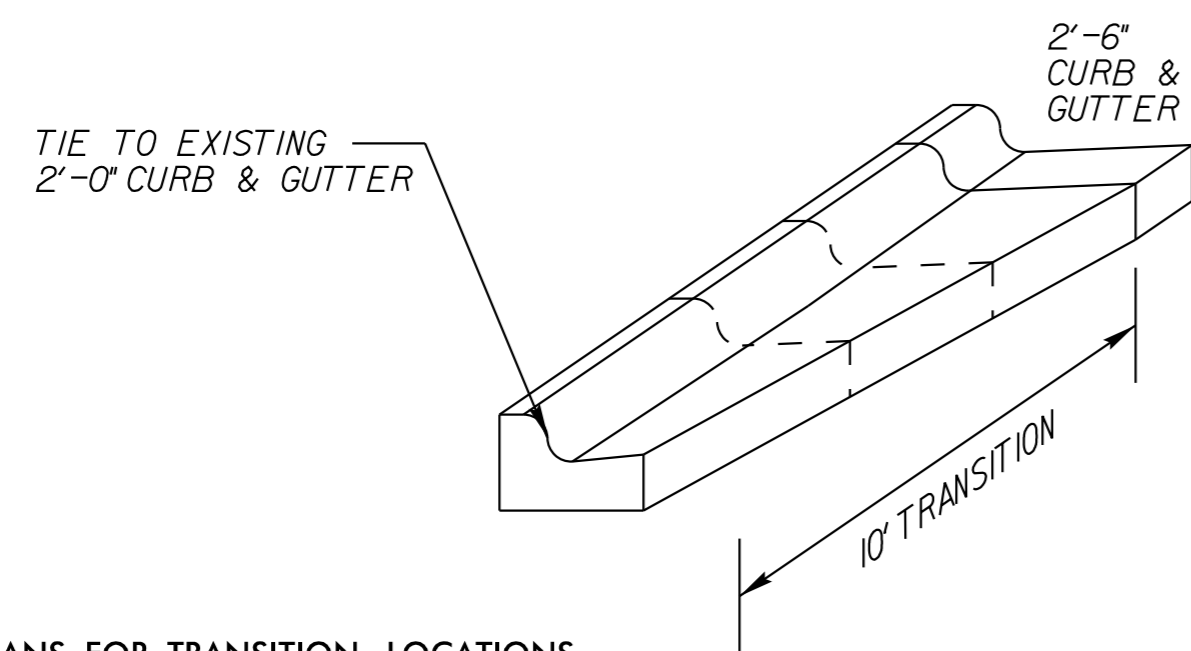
CONCRETE MONOLITHIC ISLAND TRANSITION
